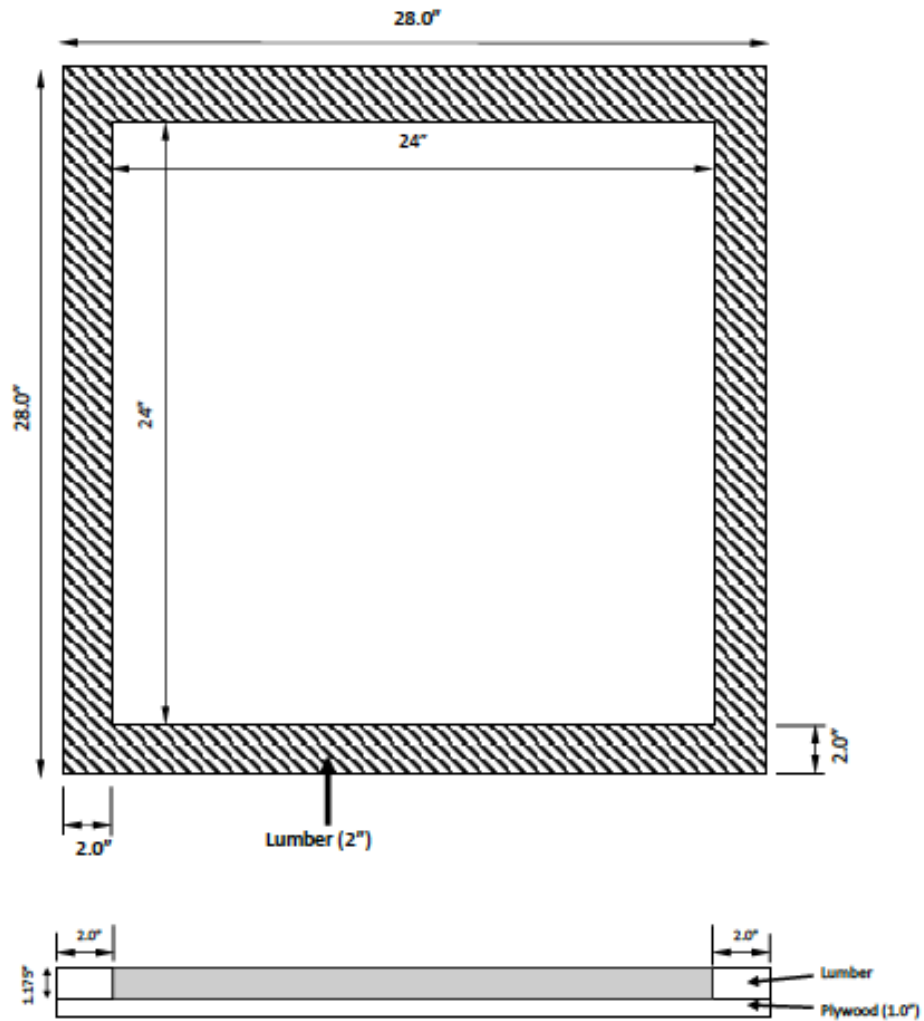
Plan view and elevation of the bond strength specimen mold
